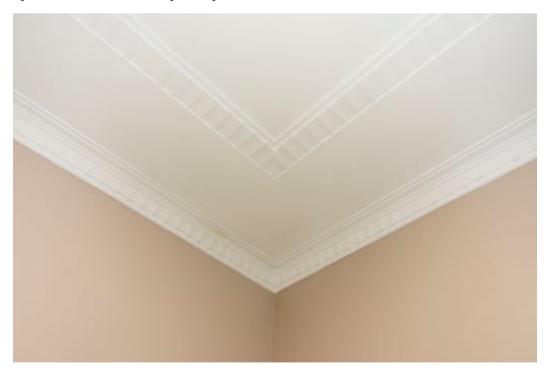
Cornice detail to $2^{\rm nd}$ bedroom ceiling, Unit 1
